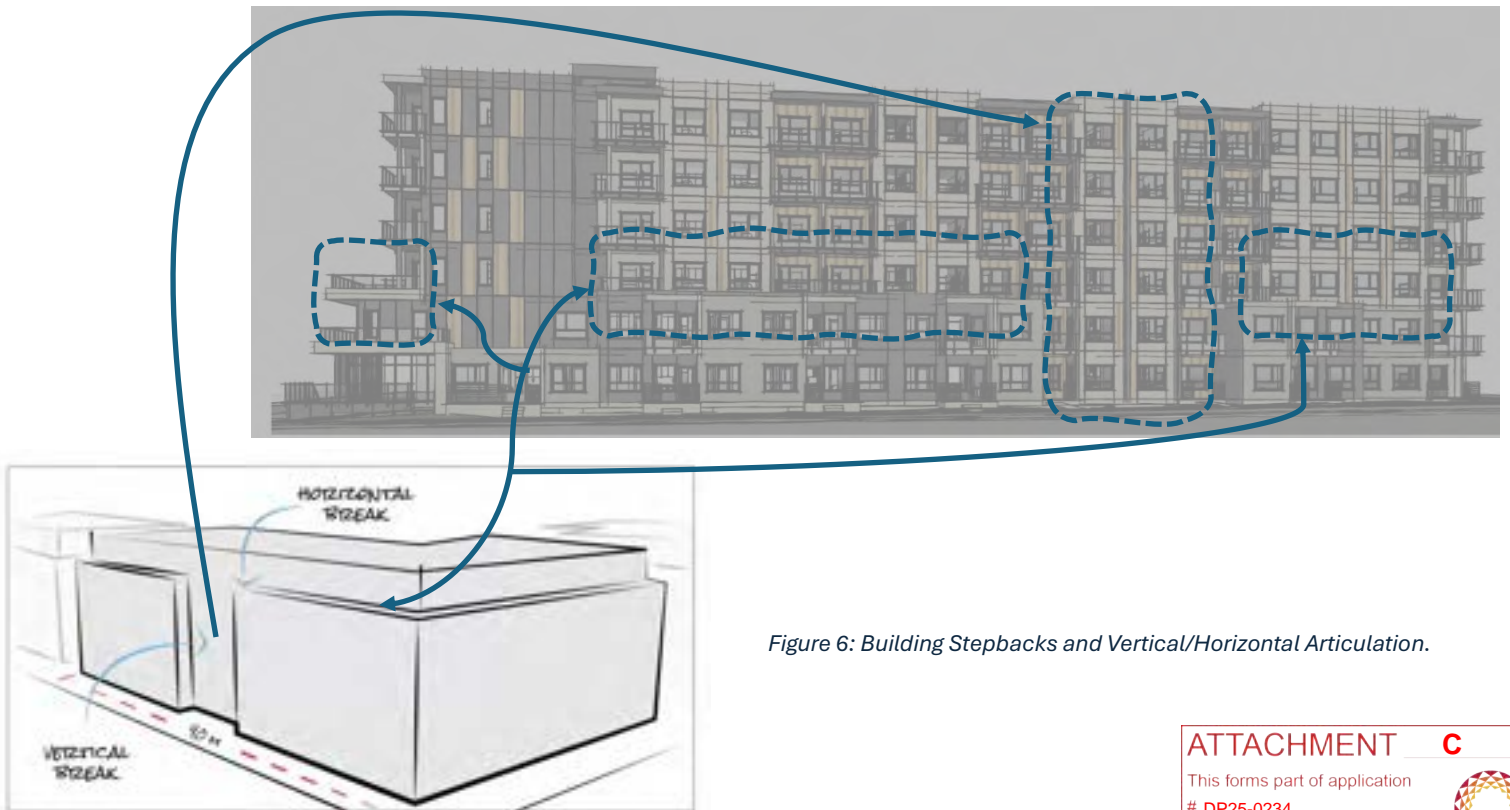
Building Stepbacks and Vertical/Horizontal Articulation.
